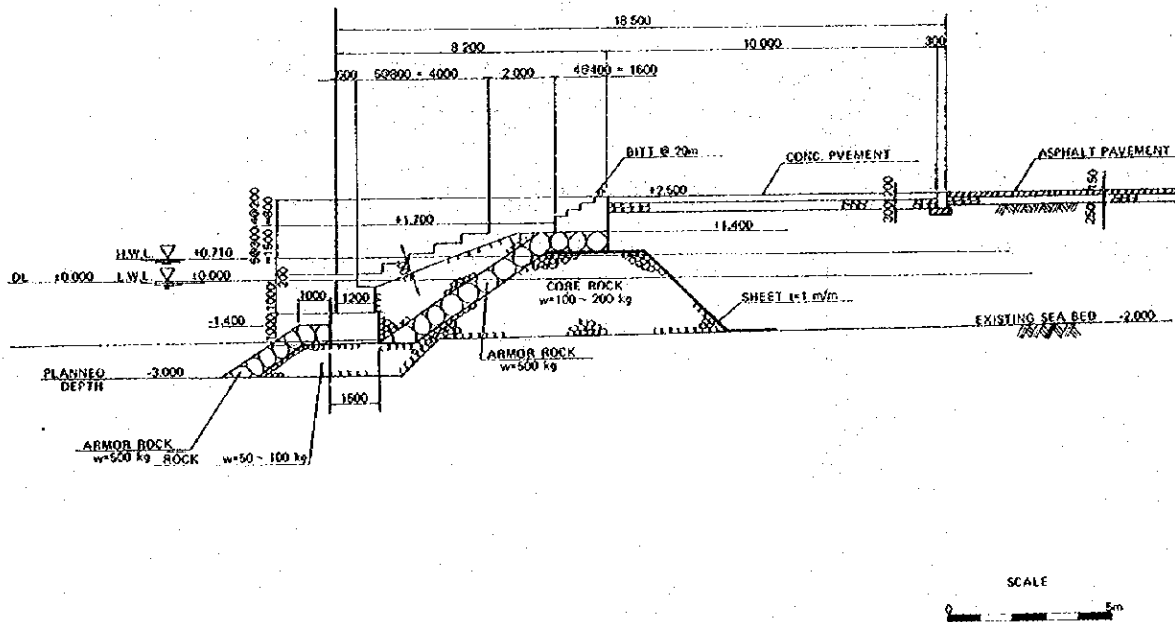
Cross Section of Stair Landing – Sual Port
